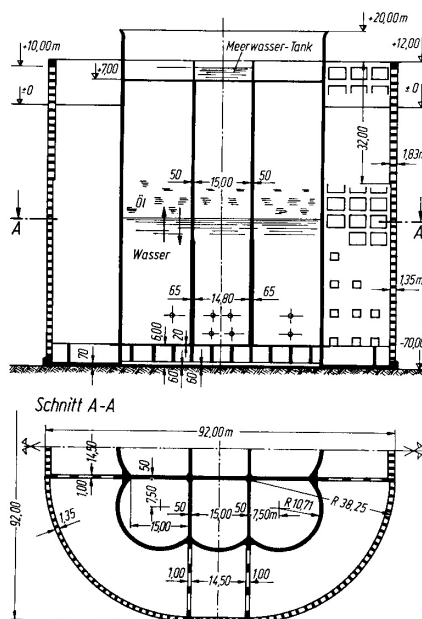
Artificial island – Ekofisk, constructed 1972-1973 using concrete caissons
